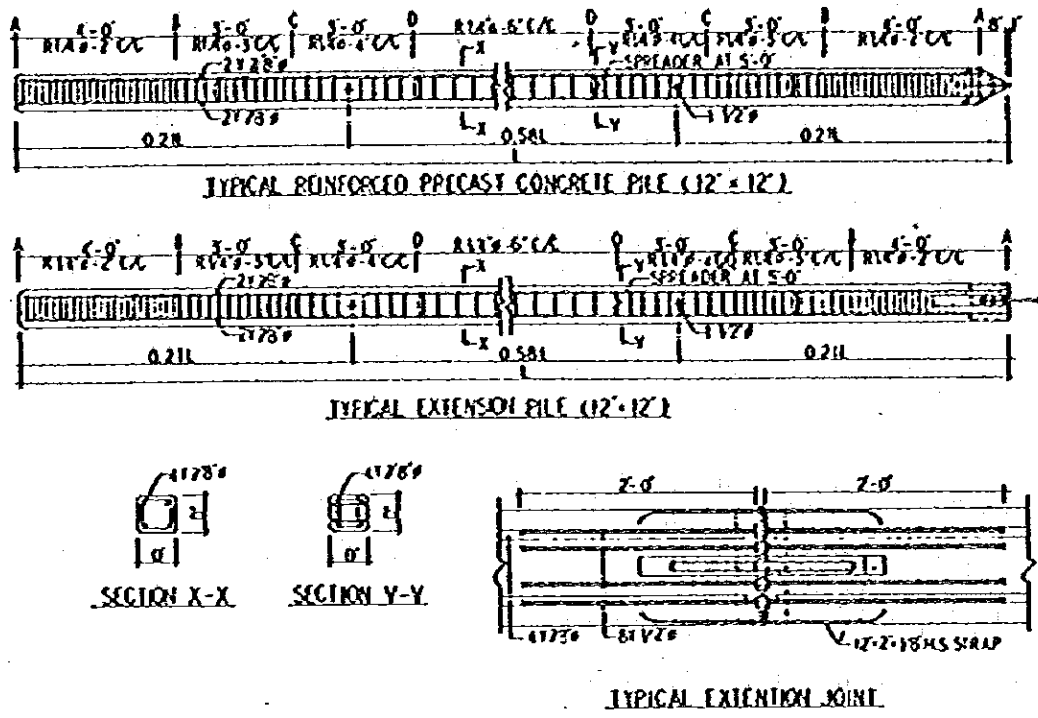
Details of Typical Precast Concrete Piles (After PWD Standard Drawings)
